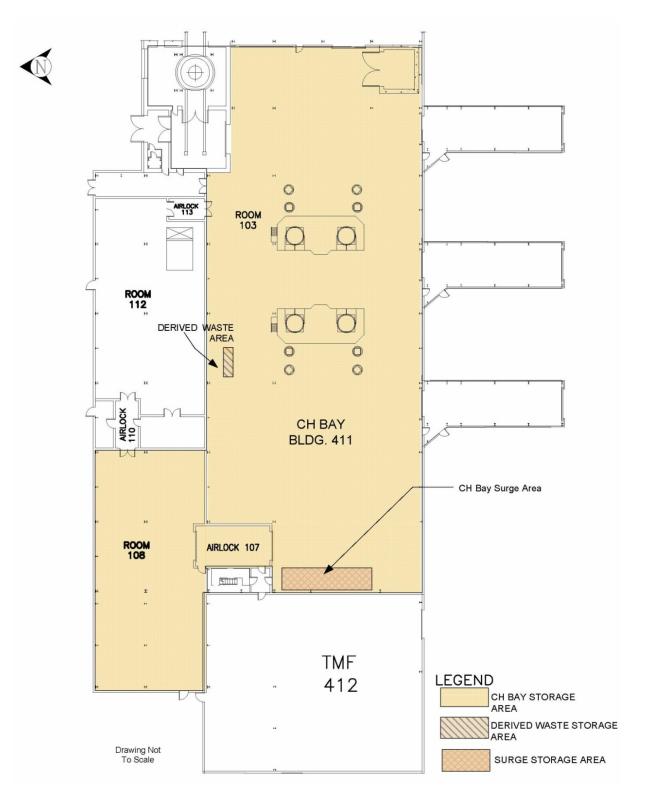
Waste Handling Building - CH TRU Mixed Waste Container Storage and Surge Areas
